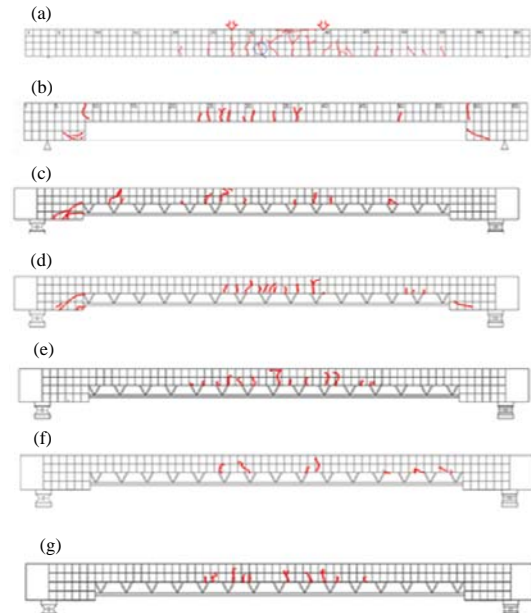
(a-g): The crack pattern of BN beam, BTR beam dan BTRP beam, (a) Normal Beam (NB), (b) BTR beam, (c) BTRP 40D beam, (d) BTRP 50D beam, (e) BTRP 60D beam, (f) BTRP 70D beam and (g) BTRP 80D beam
